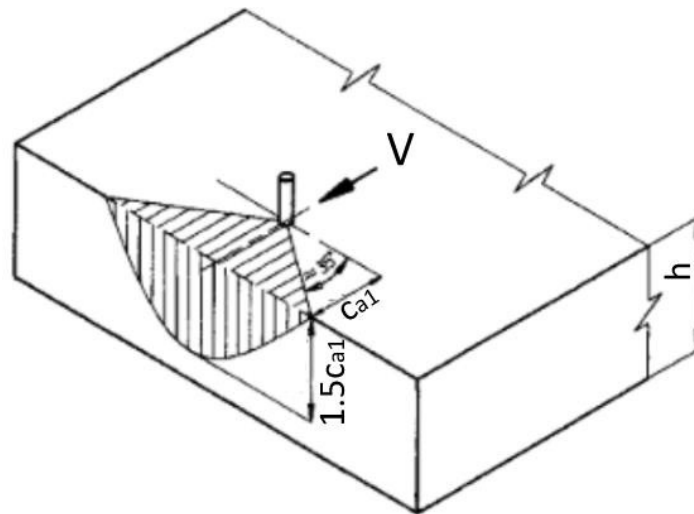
Concrete breakout mechanism in headed anchors (adapted from Fuchs et al. (1995))
